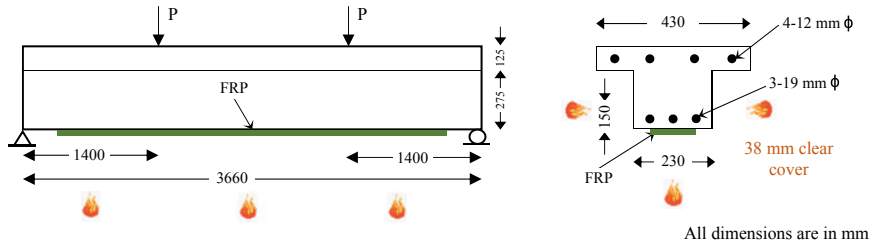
Elevation and cross-section of reinforced concrete beam strengthened with CFRP or NFRP reinforcement
